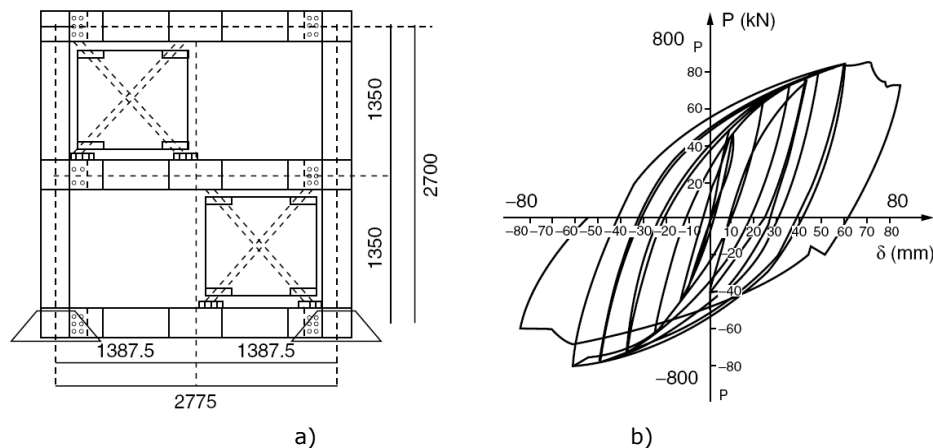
System test of BRB Subassemblies test of BRB sandwiched between precast concrete panels a) Test setup; b) hysteretic behavior [30]
